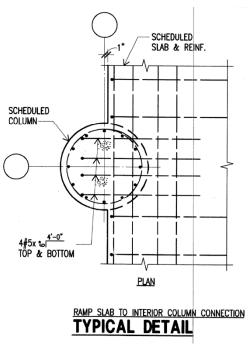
Ramp slab to column detail per structural drawings Sheet S5.0 Detail 9.
